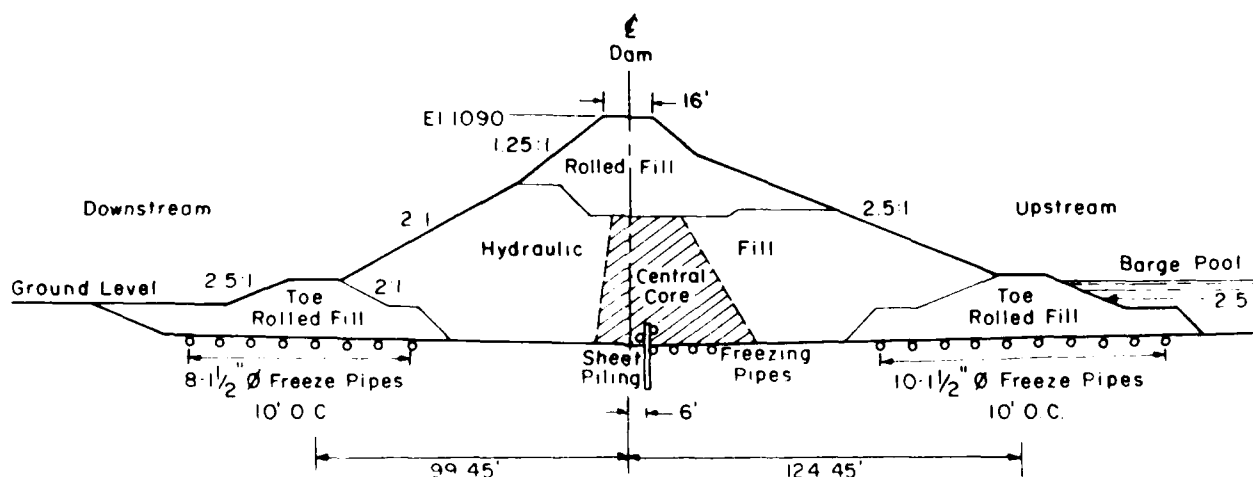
Typical embankment section, Hess Creek Dam, Alaska (after Kitze and Simoni 1972).
